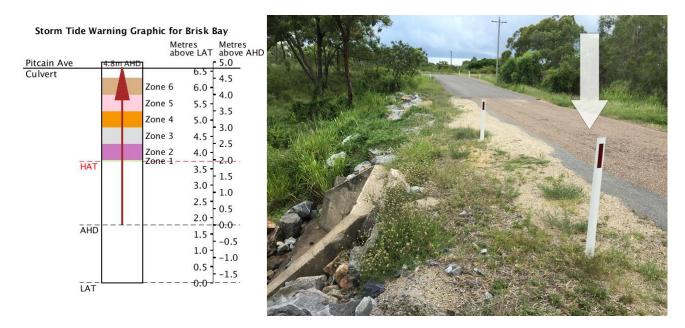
Culvert: 11-23 Pitcairn Avenue, Bowen Qld, 4805
